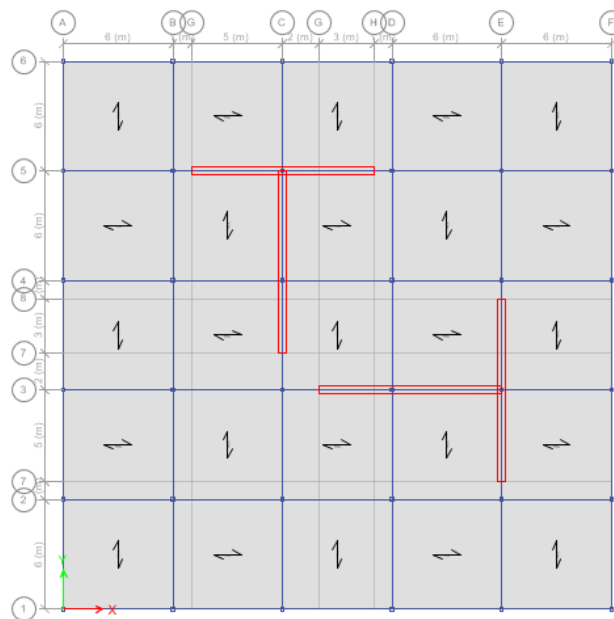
Layout of T-shaped shear walls with different flange length-to-thickness ratios in the floor plan of the 10-story building.
